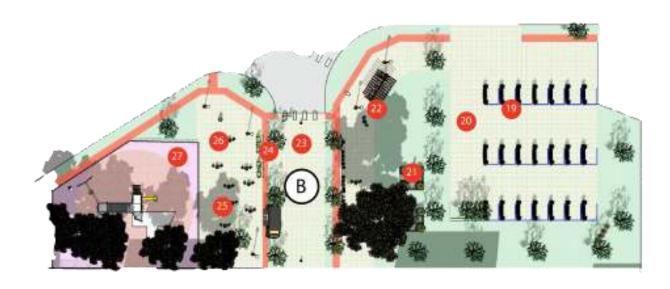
Plan view of conceptual design for American Legion and Clinton Street lots B
